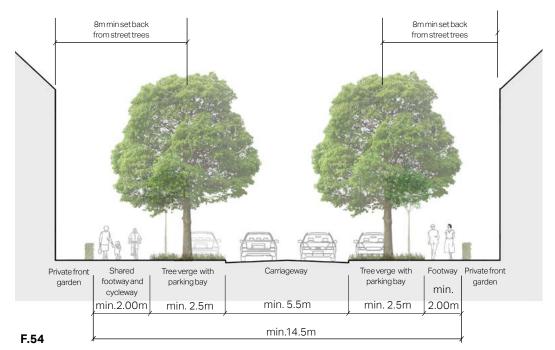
Cross-section to illustrate typical dimensions for primary streets.
